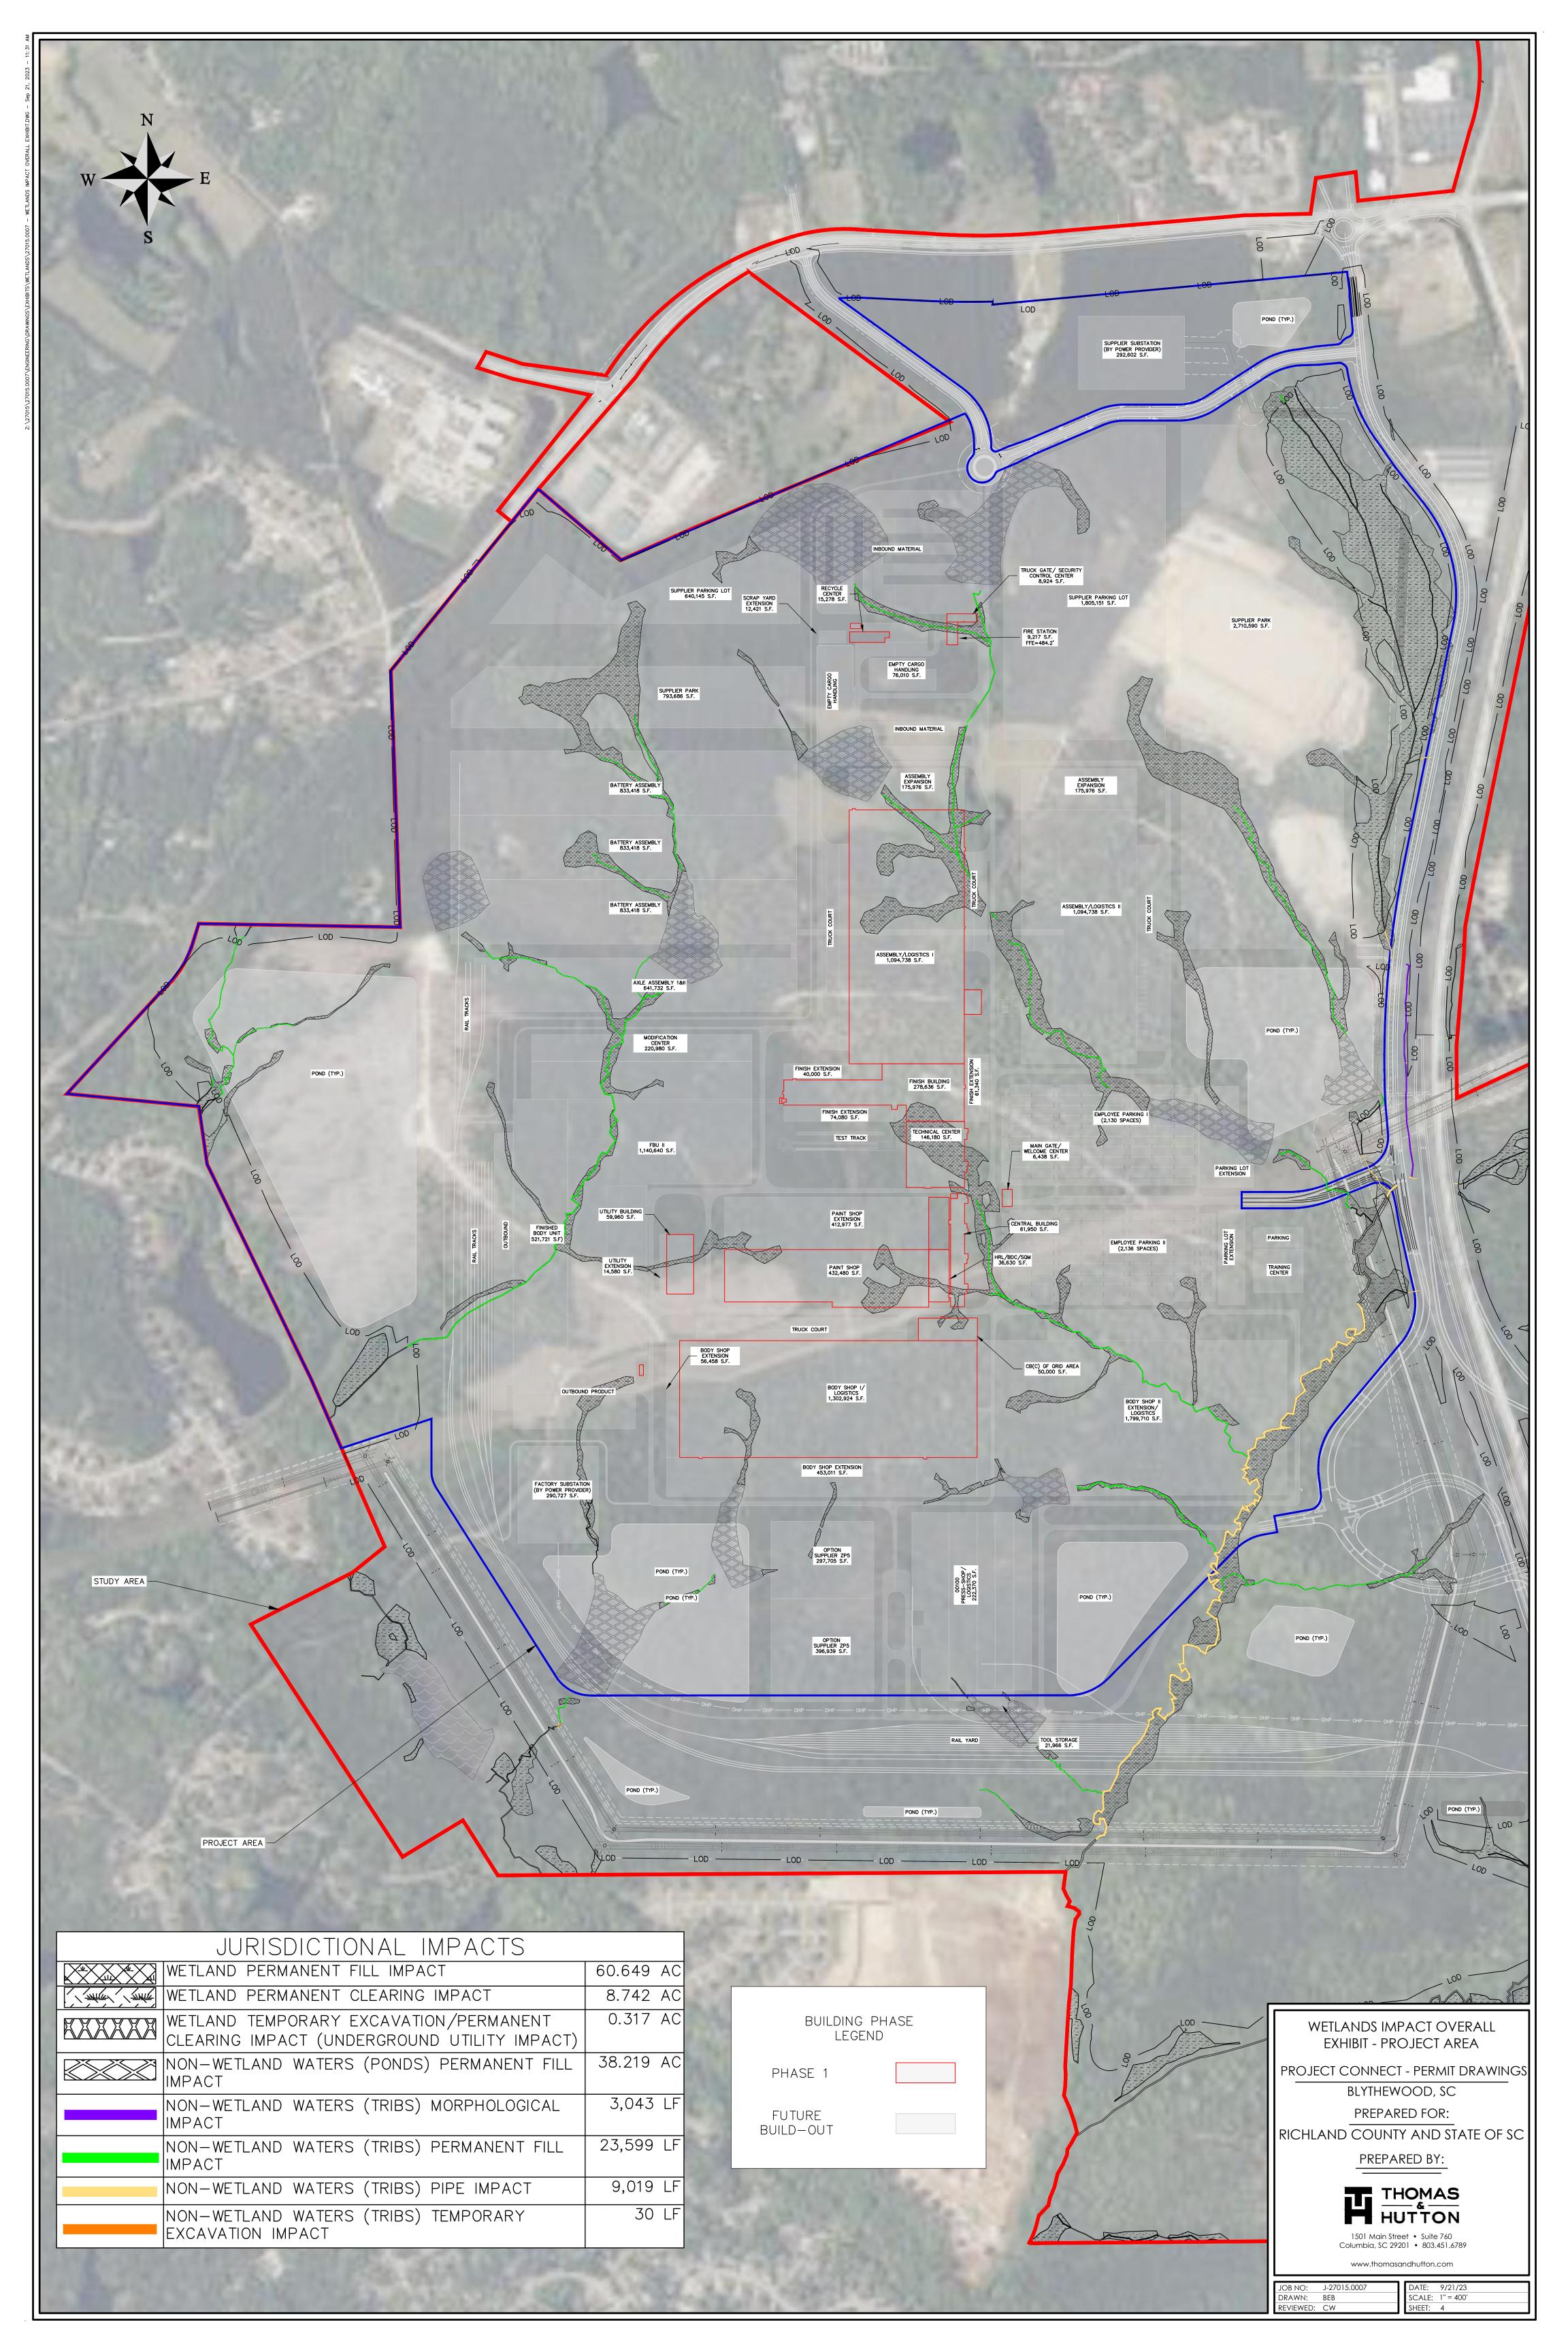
Exhibit I to Project Connect Revised Alternatives Analysis (JAB Site West Alternative Site 2)
